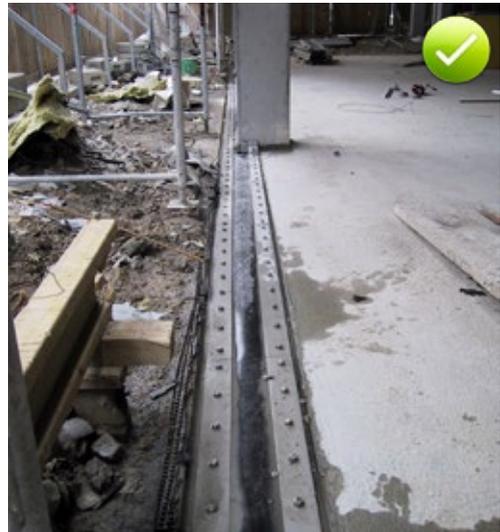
Example of a twin-legged clamped flange system for expansion joint sealing
